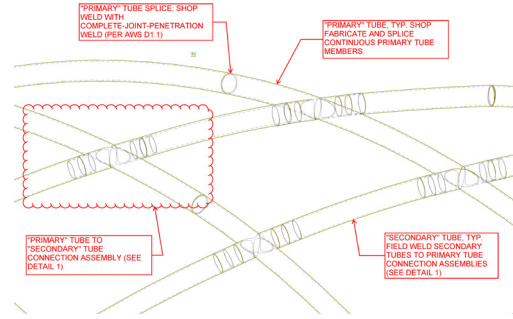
Structural Detail of Primary and Secondary Steel Tubes
